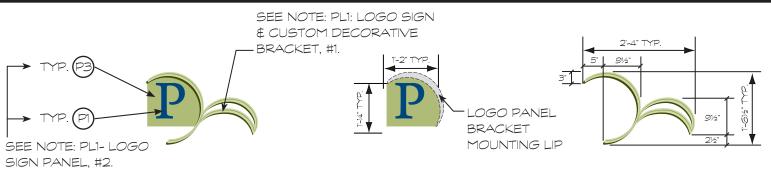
2-PIECE BRACKET WITH LOGO SIGN
